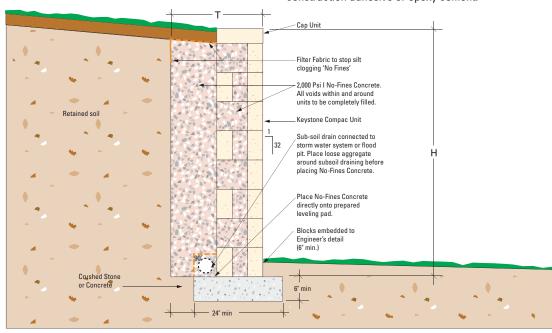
Typical Construction Detail - Keystone® No-Fines Concrete Mass Gravity Wall
